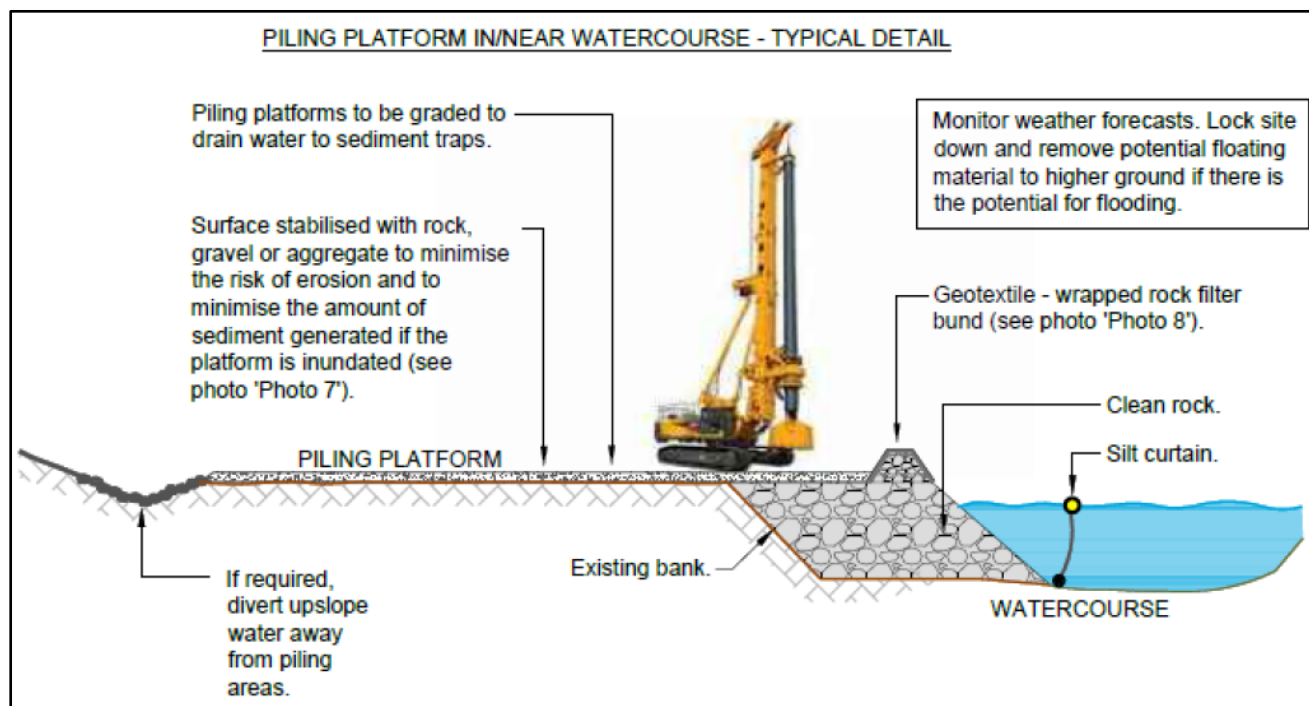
Typical detail of the temporary rock working platform in Shoalhaven River and Bomaderry Creek (not to scale) (Source: Fulton Hogan, 2019).
